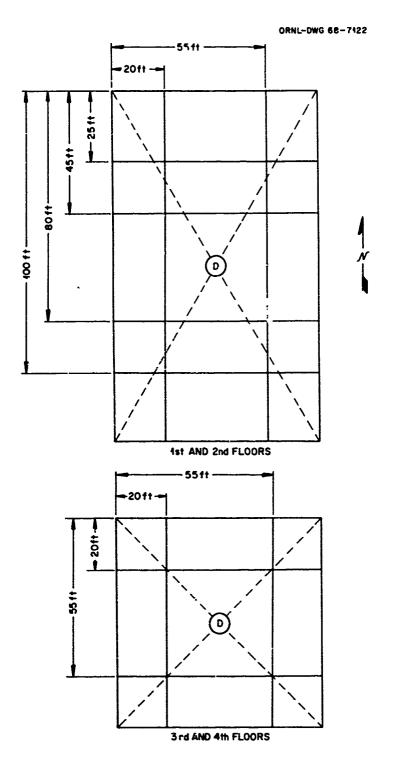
Partition Layouts c^ Floors 1 to 4 in Building No. 3.
